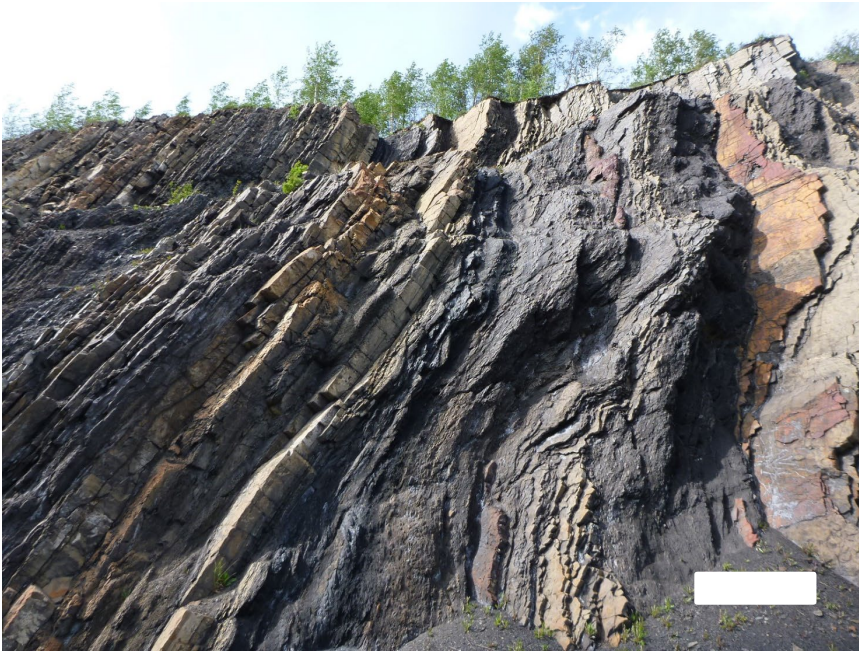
Rock slope along north side of Hwy 40:36 at GP053-I site. Note bench which could launch rockfall particles from upper slope. Photo taken June 2, 2025, facing north.
